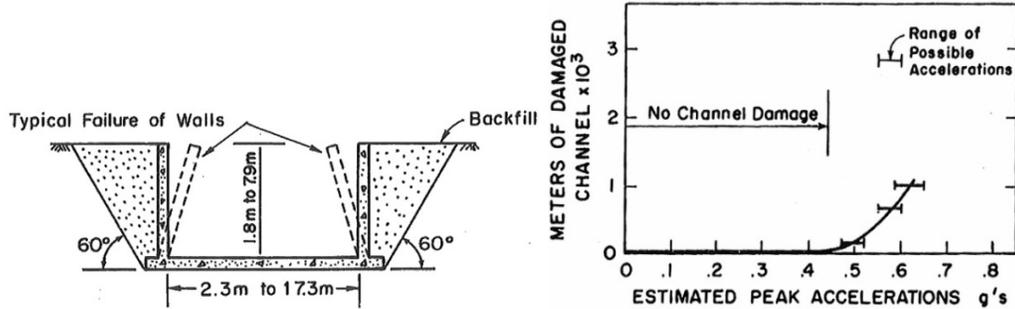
Floodway Walls in the 1971 San Fernando Earthquake, (a) Floodway Wall Configuration and Failure Mechanism, and (b) PGA versus Length of Walls Damaged (after Clough and Frigaszy 1977).
